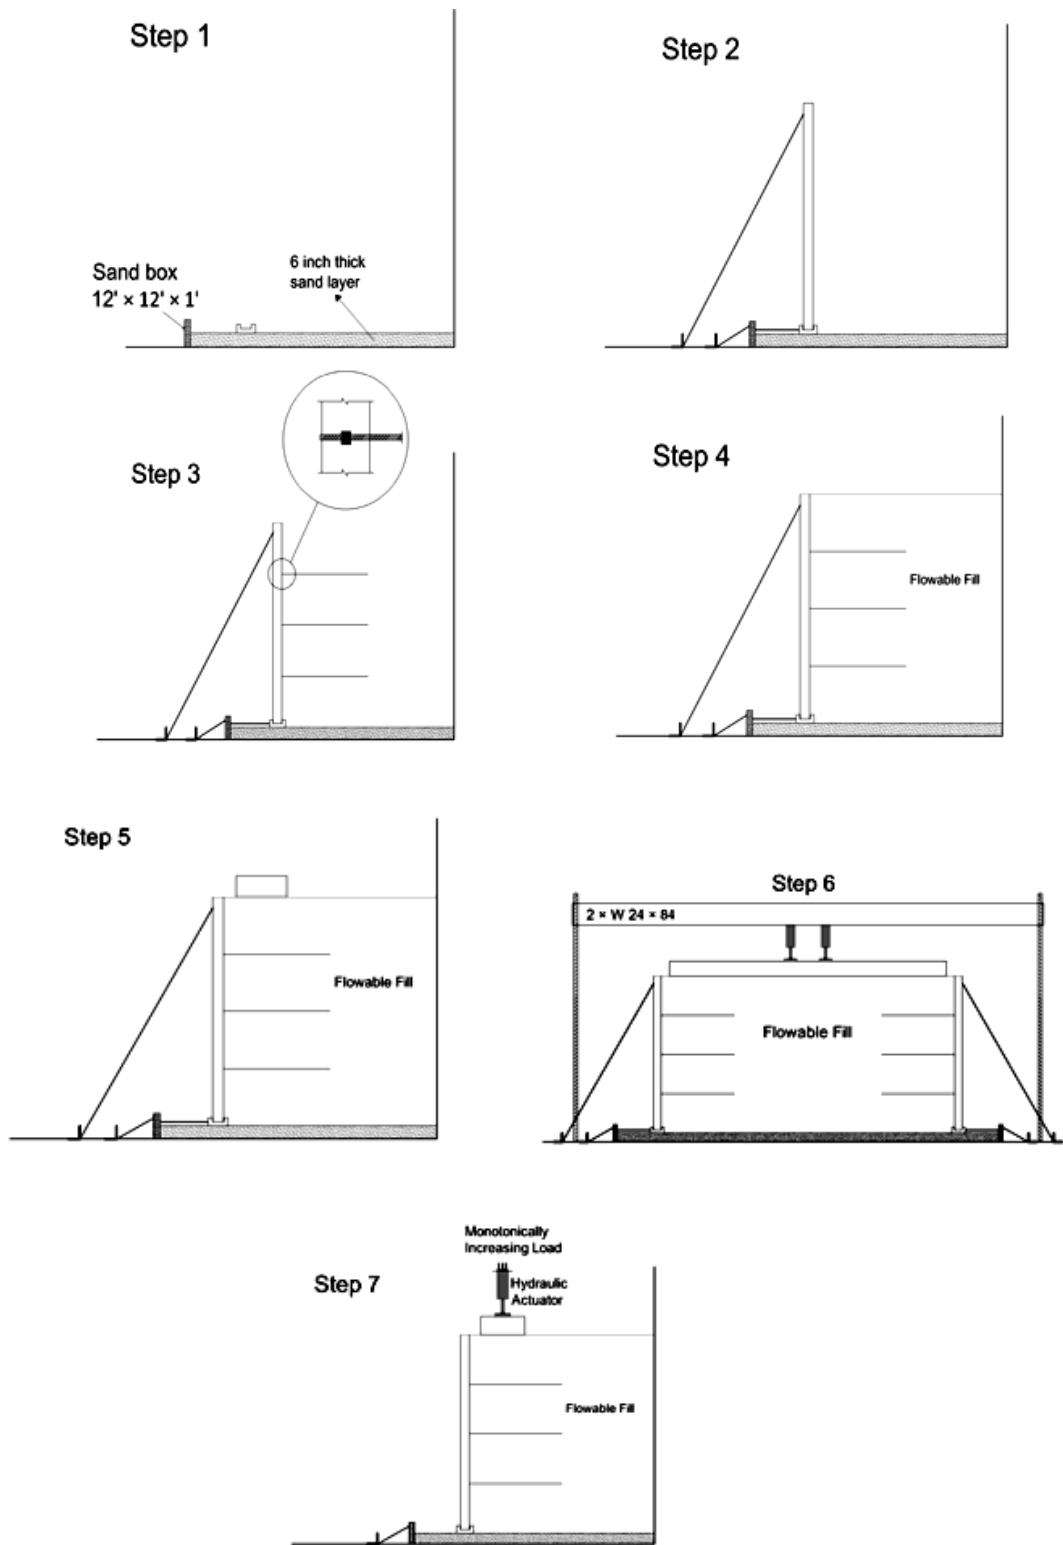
Construction sequence of CLSM bridge abutment test.
